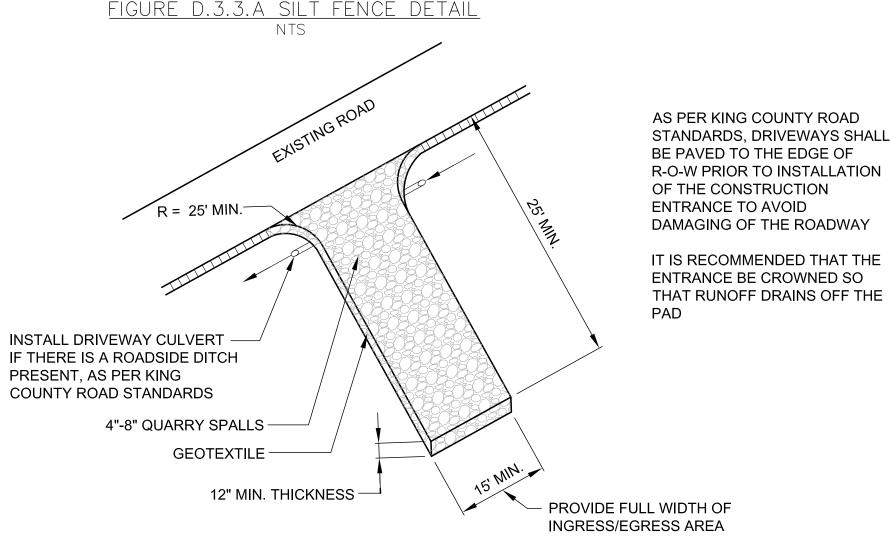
A STABILIZED CONSTRUCTION ENTRANCE DETAIL
